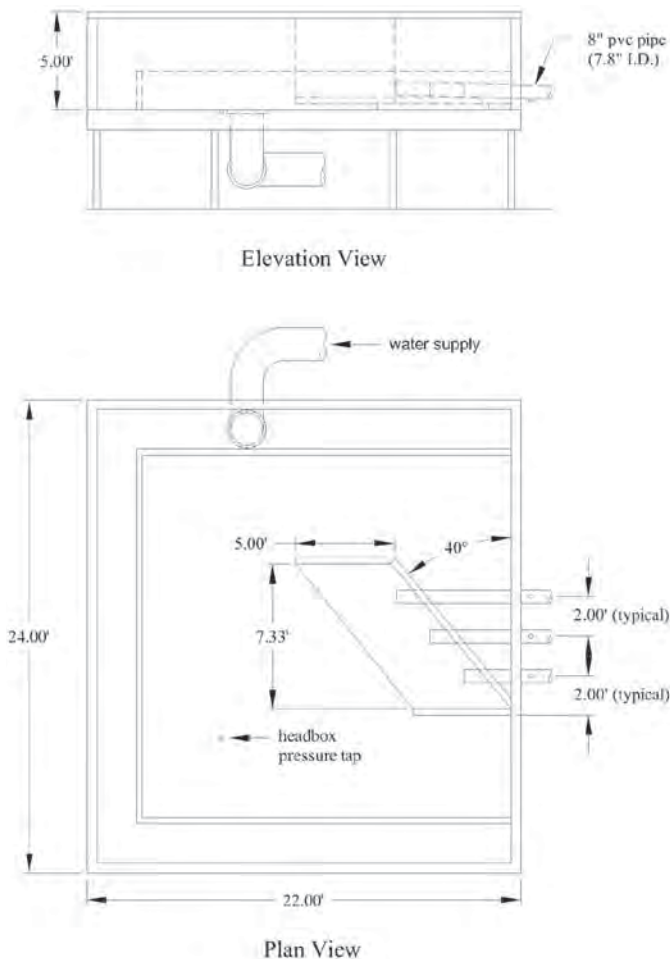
(C). Multibarrel culvert configuration with 3D horizontal barrel spacing and a 40°, skewed, rectangular approach channel.
